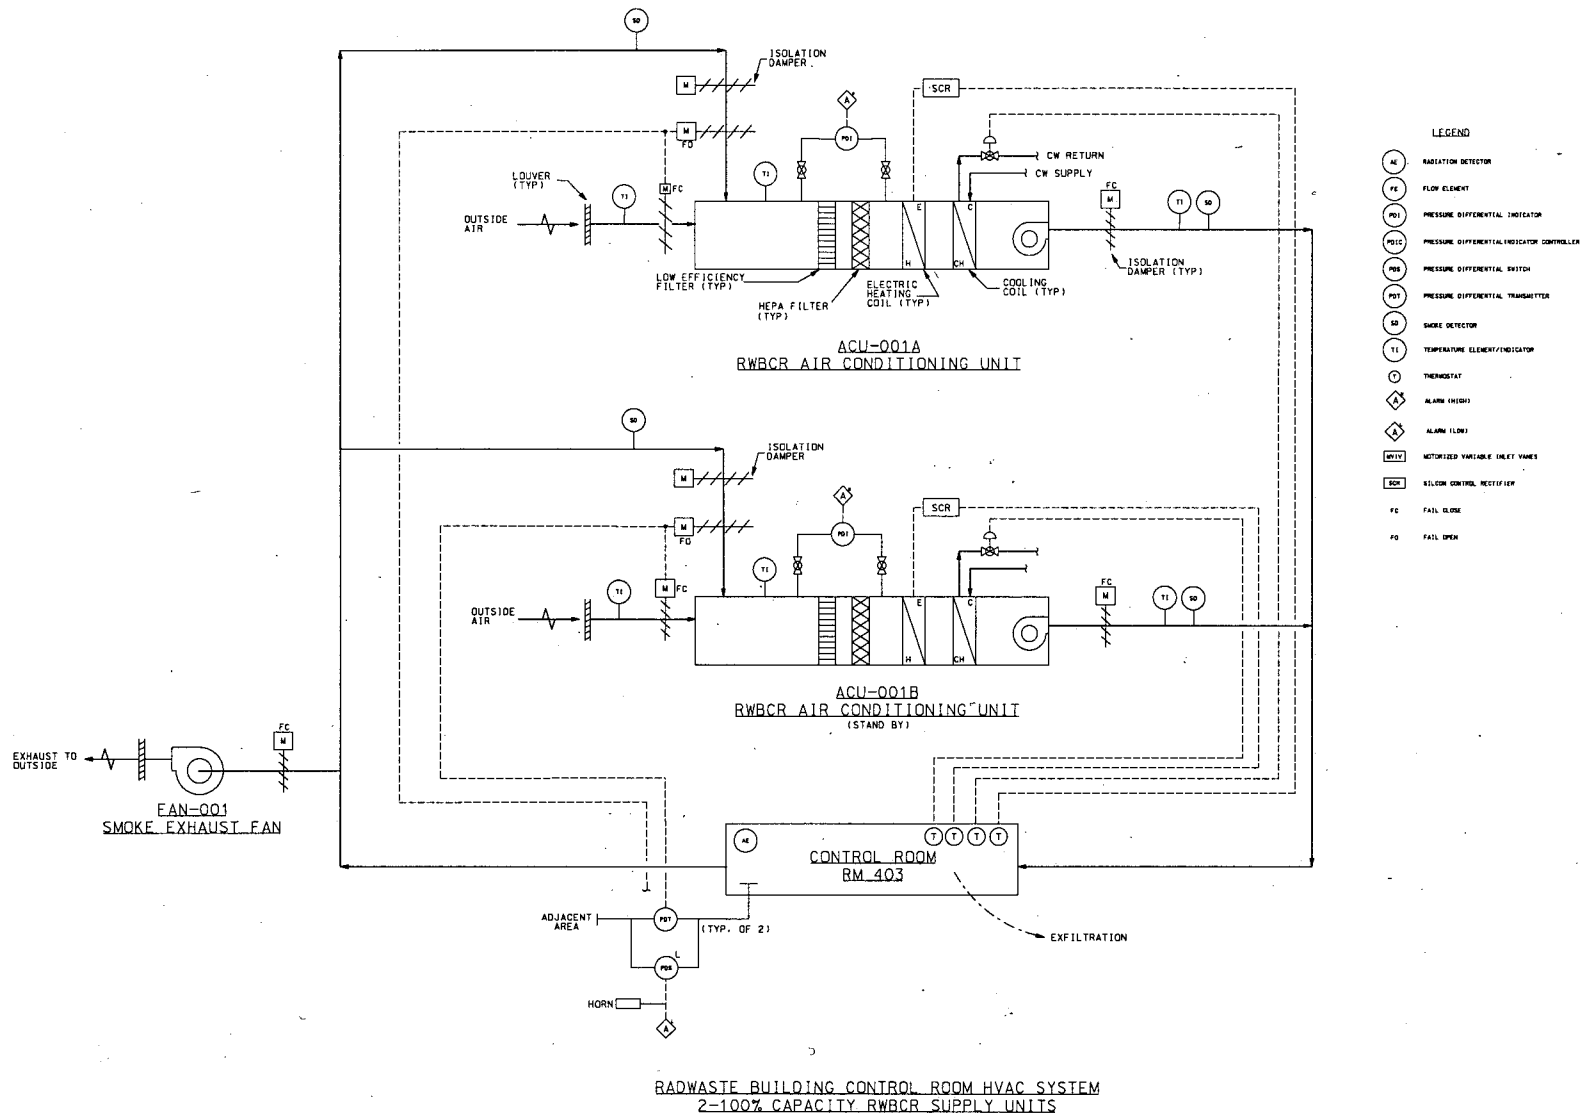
Radwaste Building HVAC P&ID (Sheet 1 of 3)
